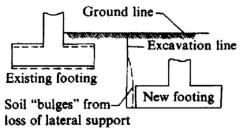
The Possible settlement for existing foundation due to the lack of suitable retaining wall [2]
